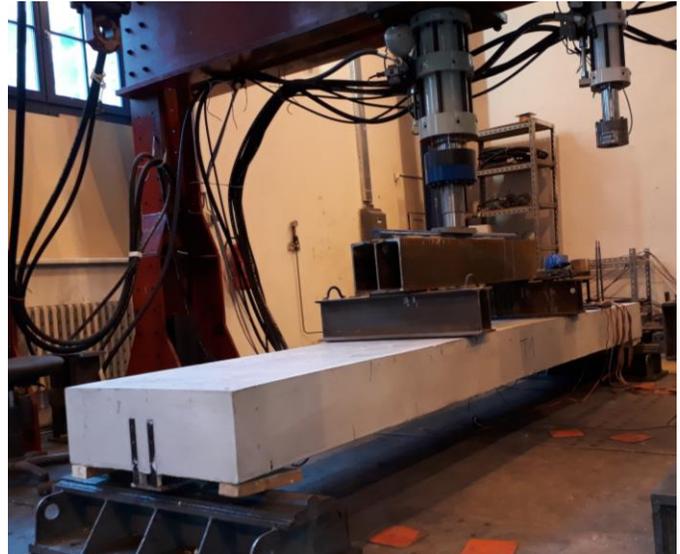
four-point bending test, simply supported beam with visible shrinkage cracks
